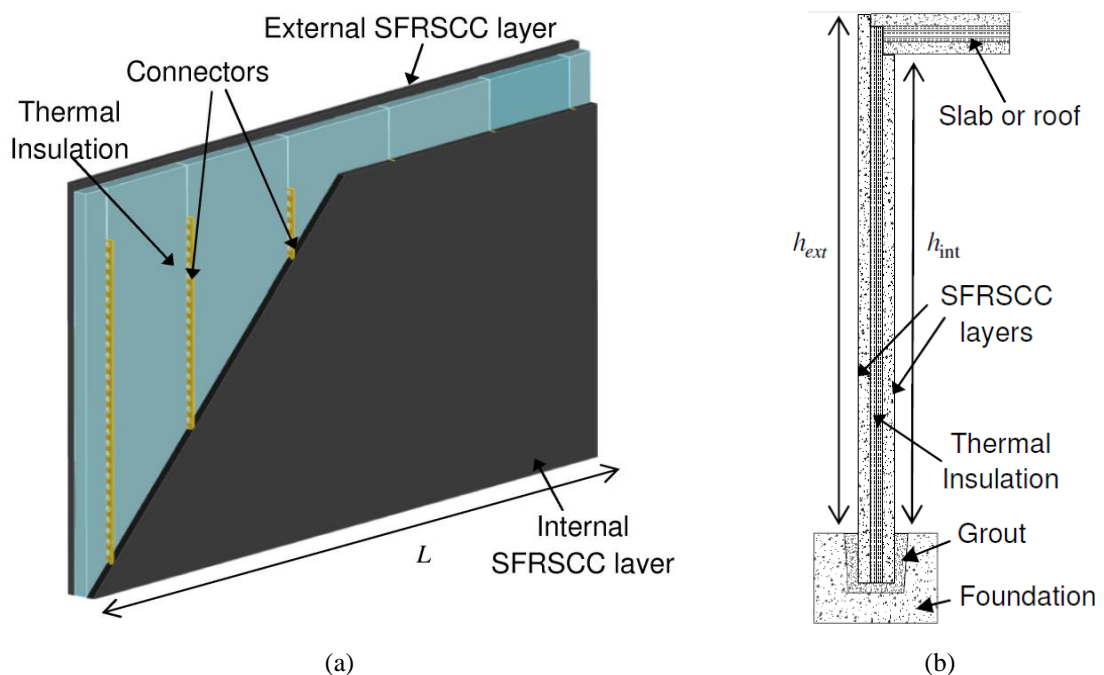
Proposed building system: (a) components of the devised load-bearing sandwich wall panel; (b) system cross section.
